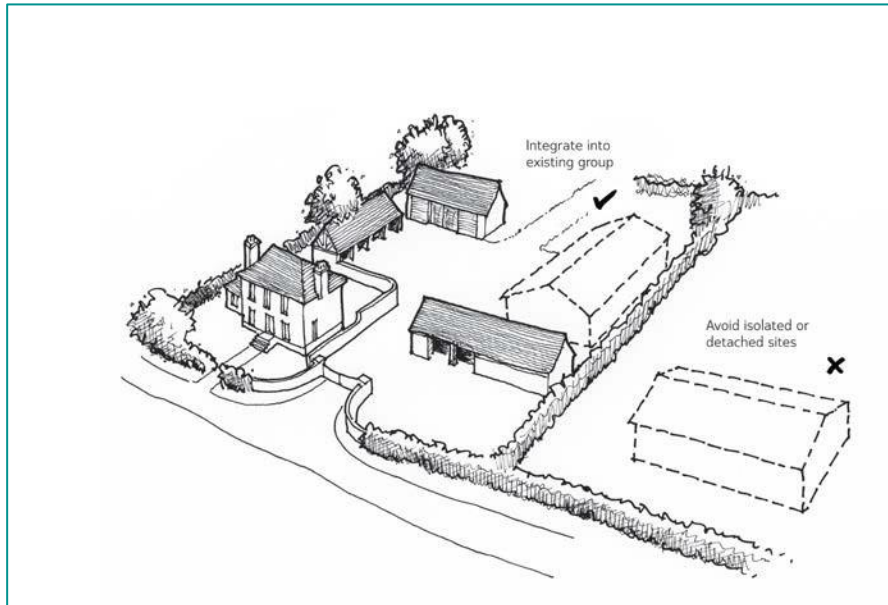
Good and poor examples of how buildings may be grouped to reduce impact.
